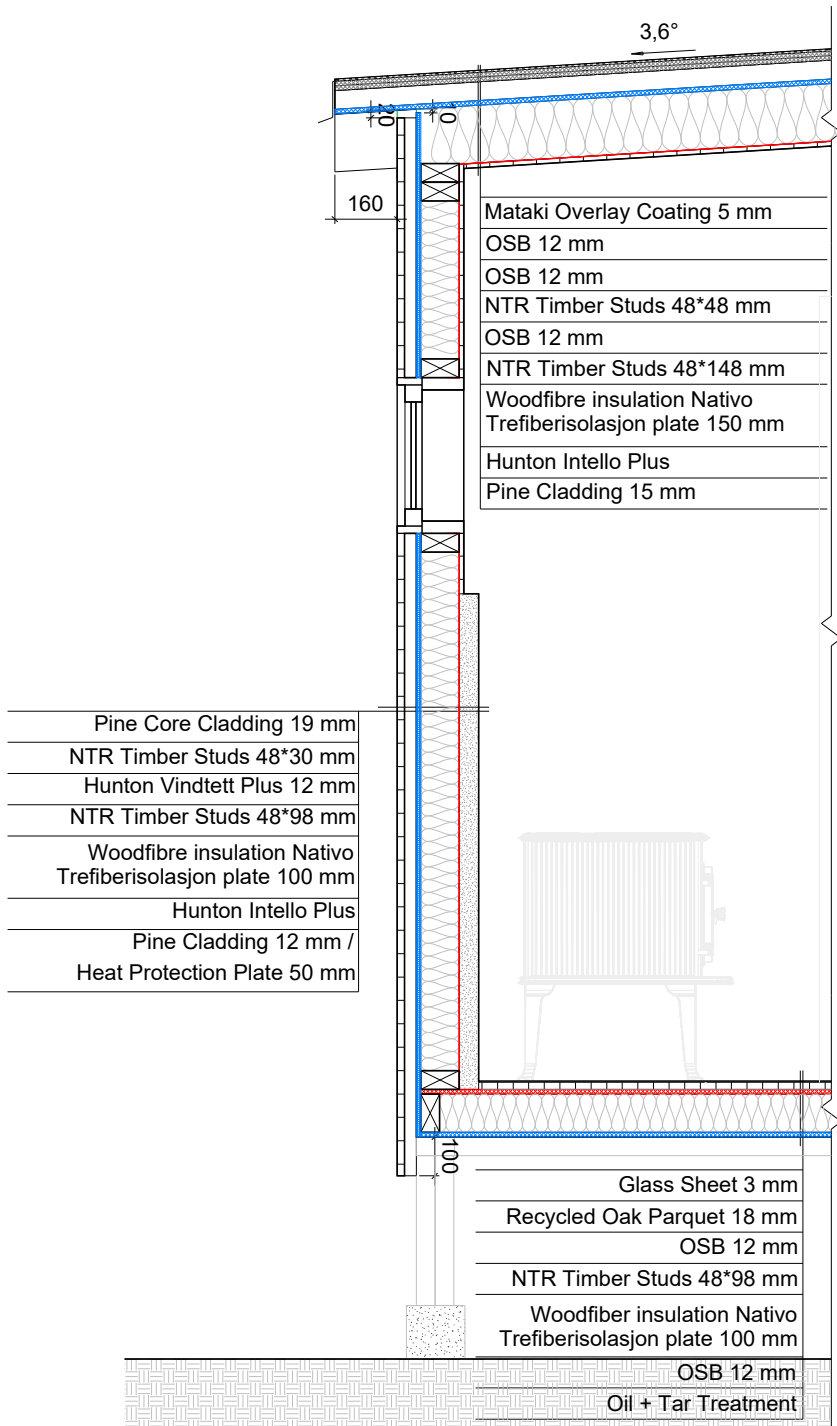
DETAIL OF SECTION D-D. SCALE 1:20
